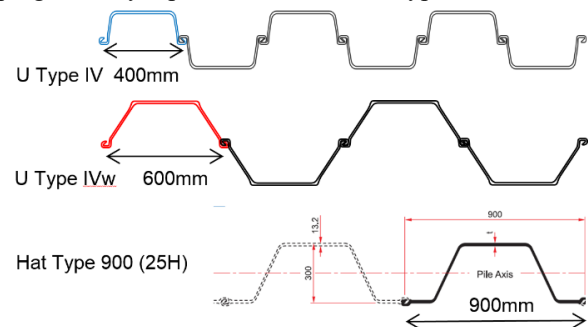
Wider Type of Steel Sheet Piles (U type & Hat type)
